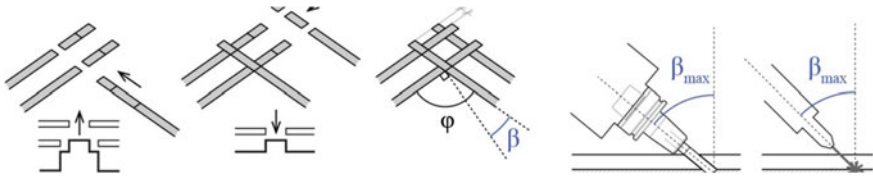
Fully integral 2-layer assembly with double through tenon joints (*left*); fabrication constraints (*right*)
